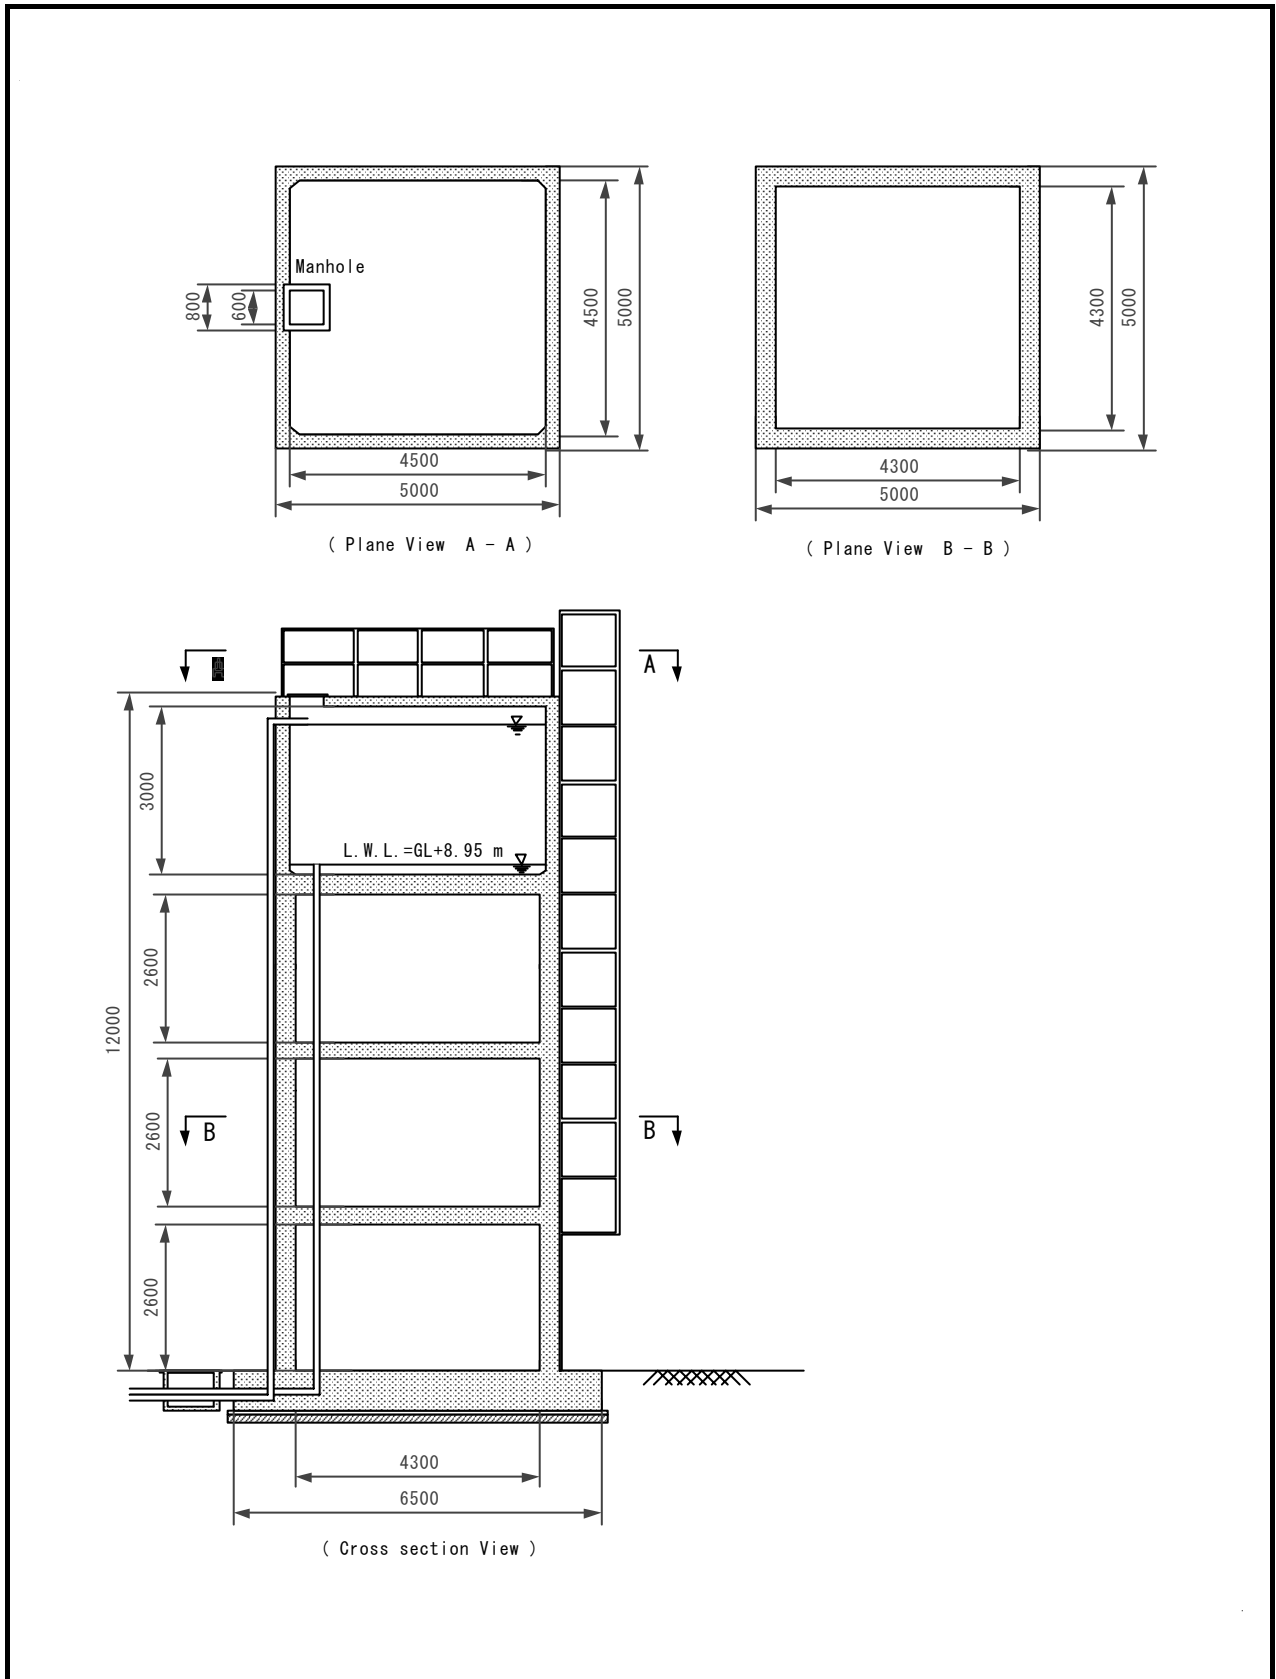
DESIGN OF STORAGE TANK -ELEVATED TANK (2)
